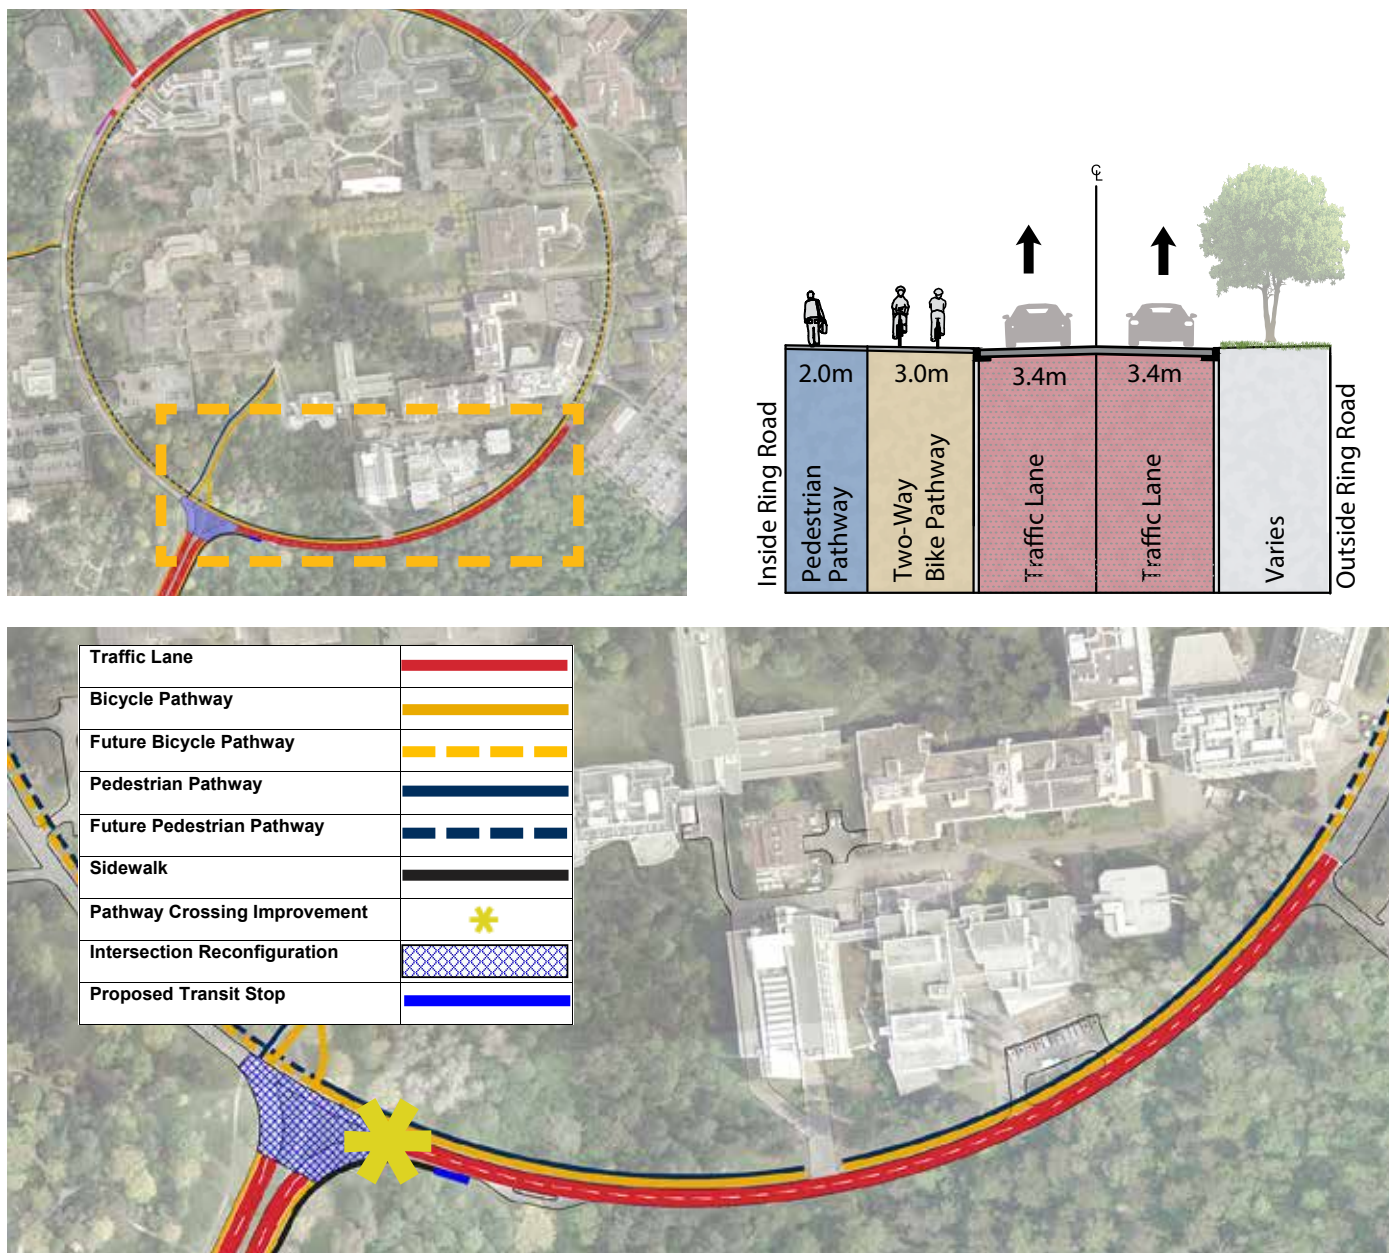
McGill Road to the Student Union Building Separated Pedestrian and Bicycle Pathways
